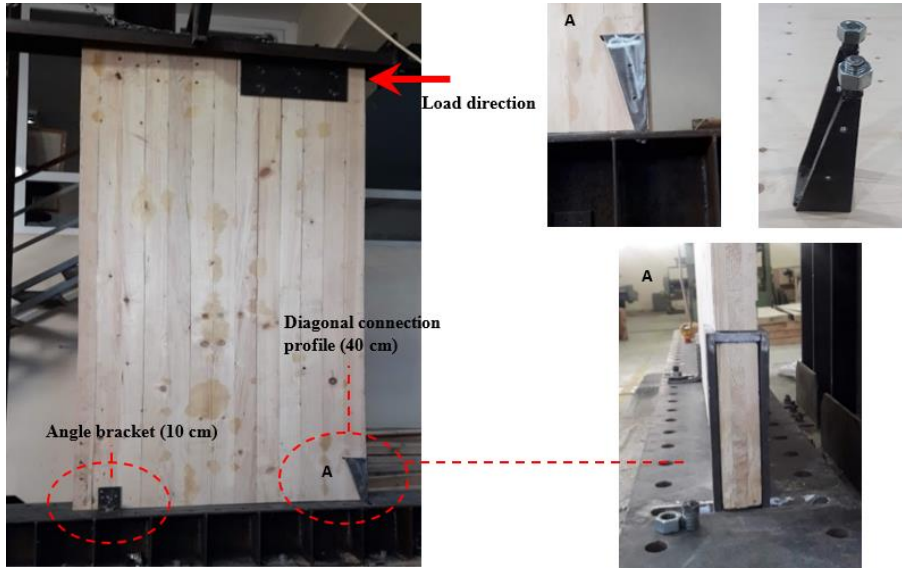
CLT wall to foundation Detail-6 and deformation of connectors
